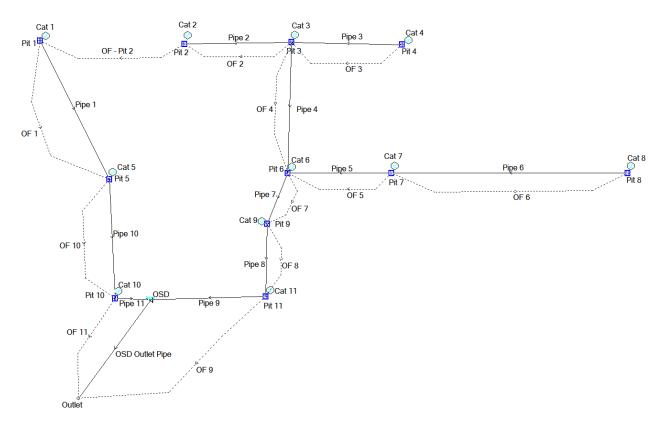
Proposed Stormwater Drainage Layout (Developed Case)
